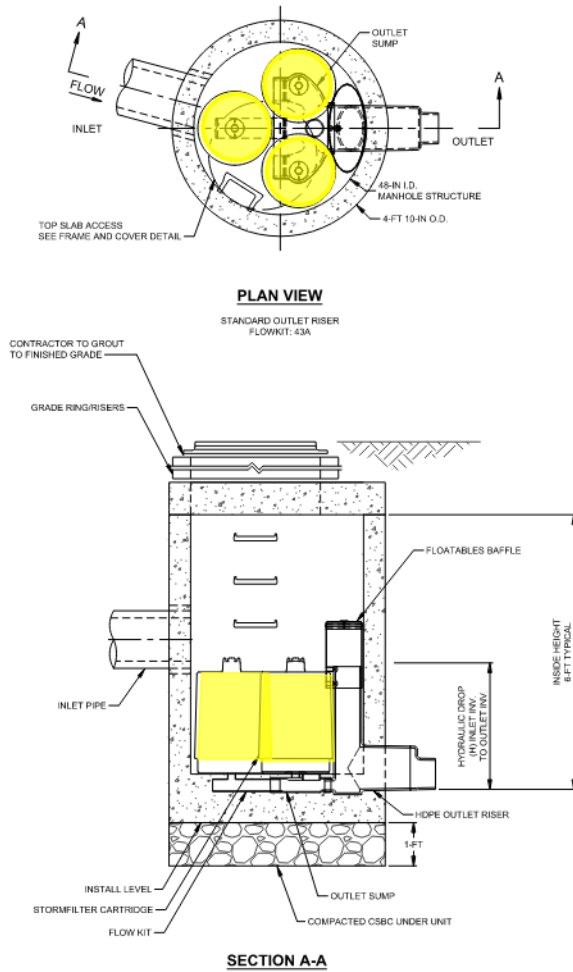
StormFilter Facility Details: 4-foot Diameter Manhole (WQ-1 and WQ-2)
